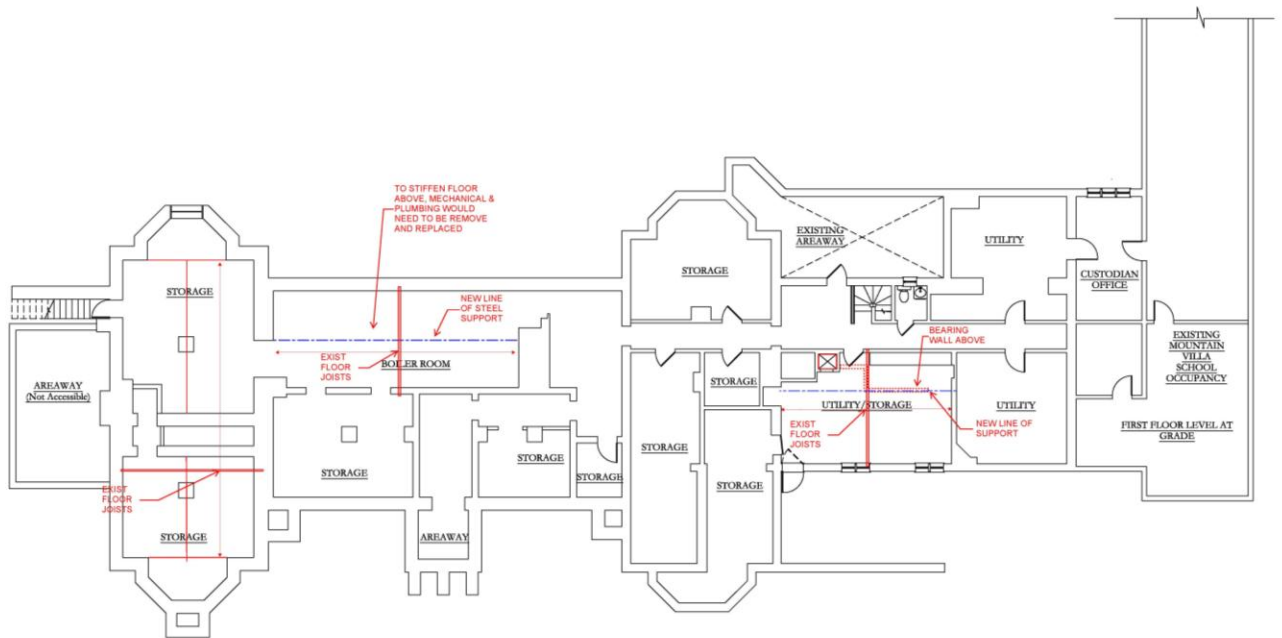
Basement Plan indicating areas of proposed first floor structural work in red
